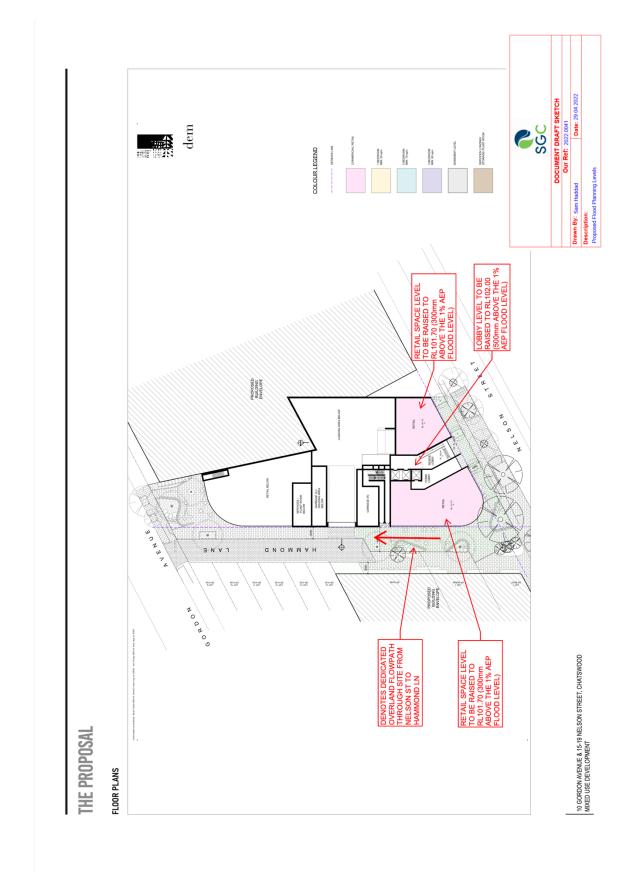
Proposed Flood Planning Levels – Ground Floor
